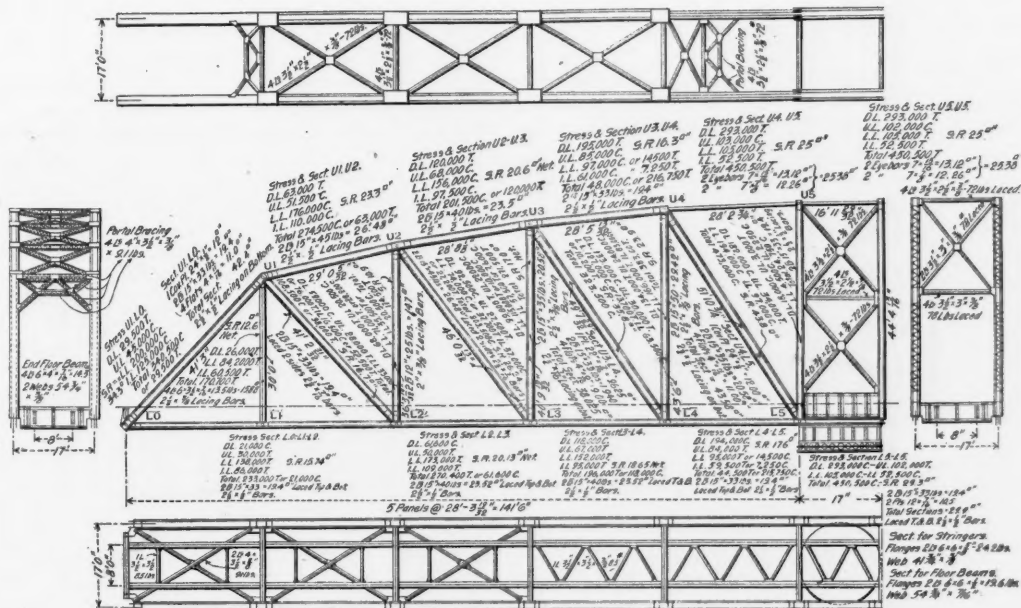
Stresses and Sections—Draw Span, Red River Bridge.
